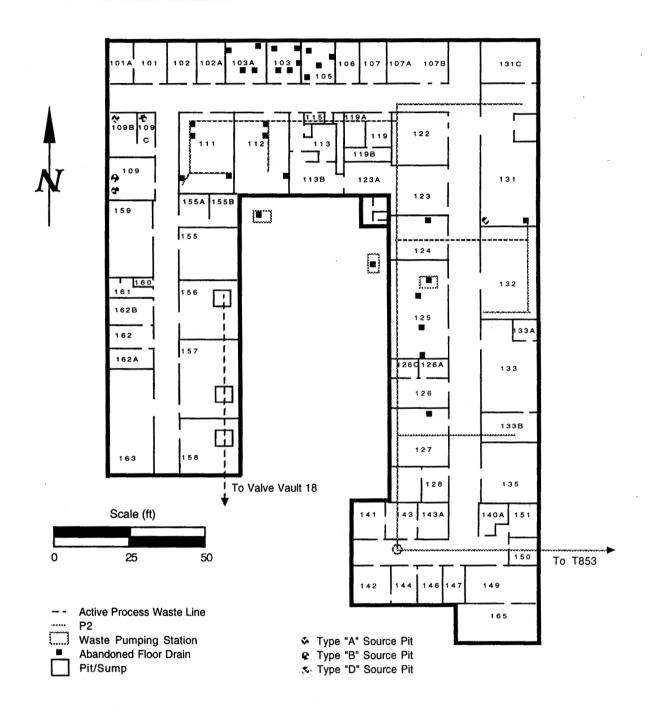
Locations of Abandoned Floor Drains and Pits in Building 123
